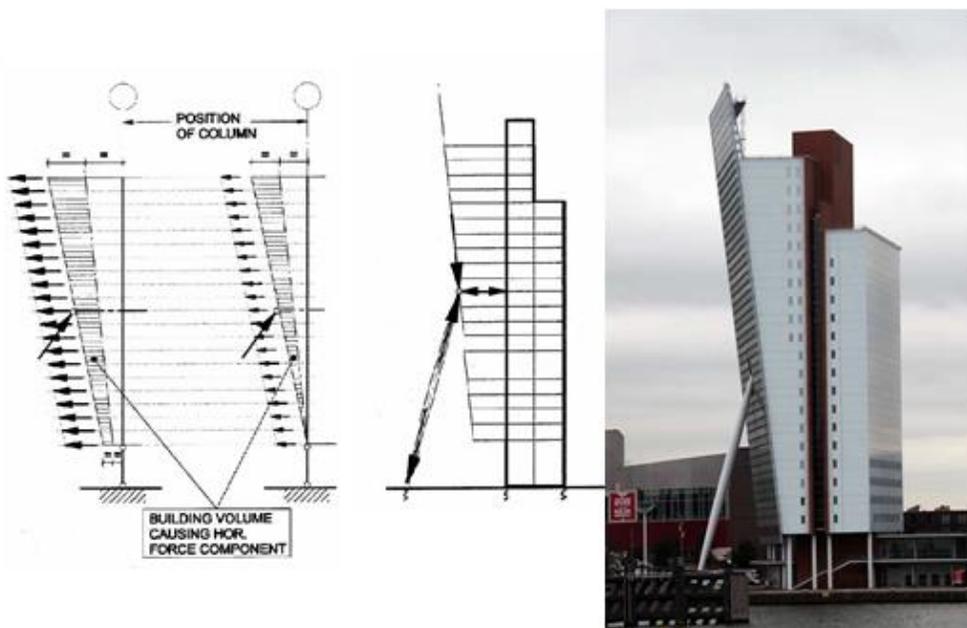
Belvedere Building, Rotterdam - Horizontal Forces Scheme (left), Inclined Strut (mid), Constructed Building (right) [41]
